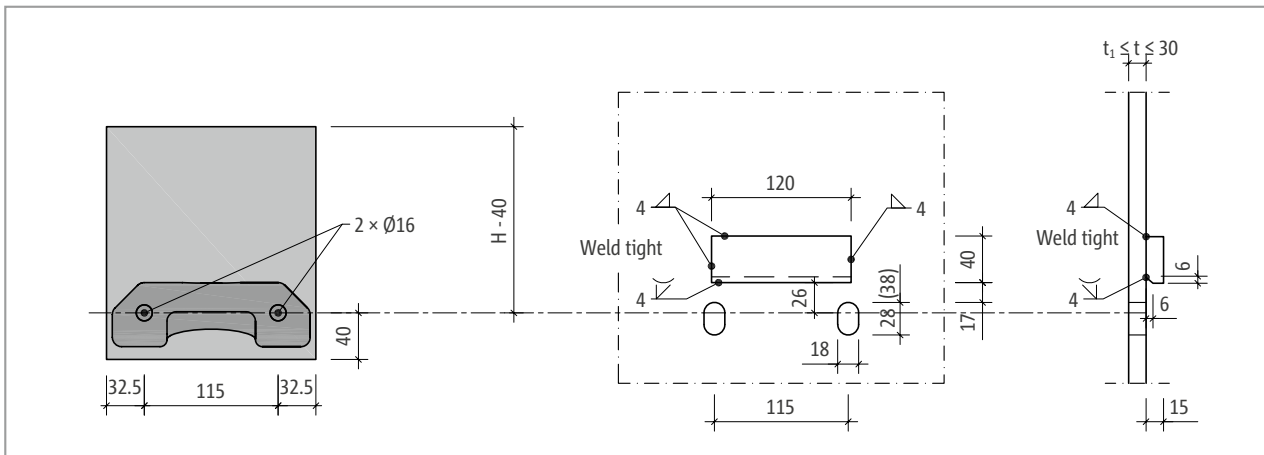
Schöck Isokorb® T type SQ: Design of the fixing plate connection
